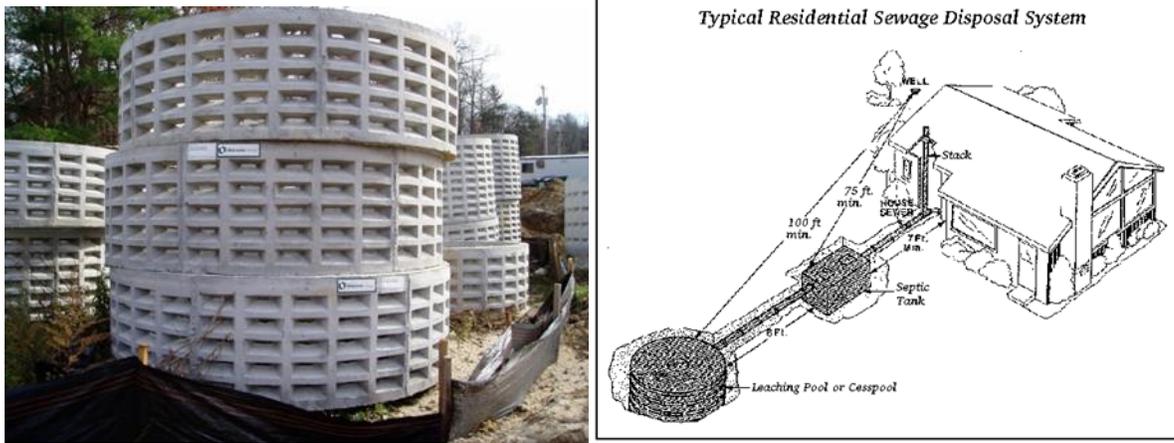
Precast Leaching Rings (Left) & Typical System layout (Right)
